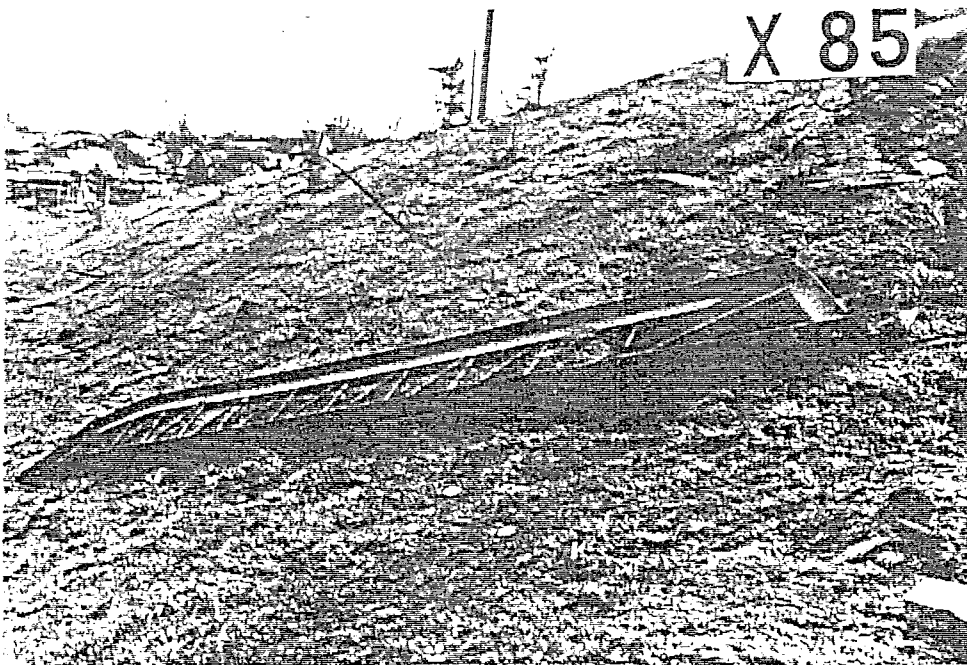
OPEN WEB STEEL JOIST. The joist, 20 ft long, was found at the location marked on Fig. 58. The original location of this joist was not found within a 300 ft radius area.
